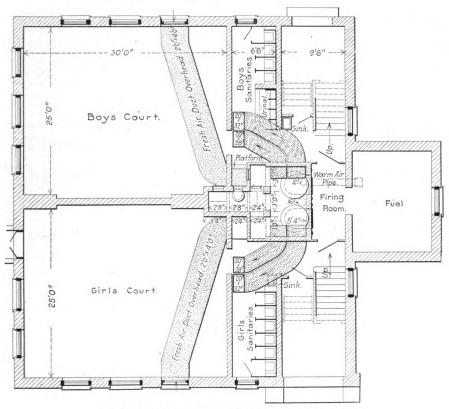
Basement Plan, Showing Location of Furnaces, Pipes, &c.
